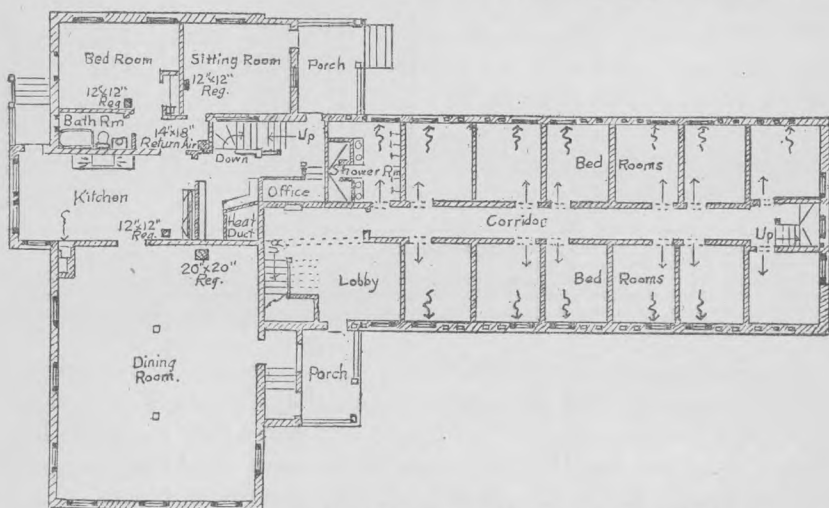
FIRST-FLOOR PLAN OF BOARDING HOUSE FOR STAFF EMPLOYEES.
